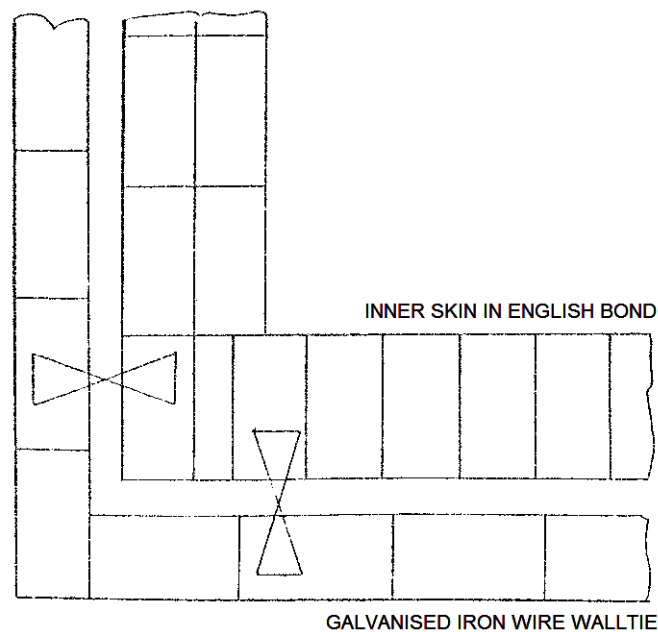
(b) Alternate plan courses for 395 mm cavity wall – inner skin
